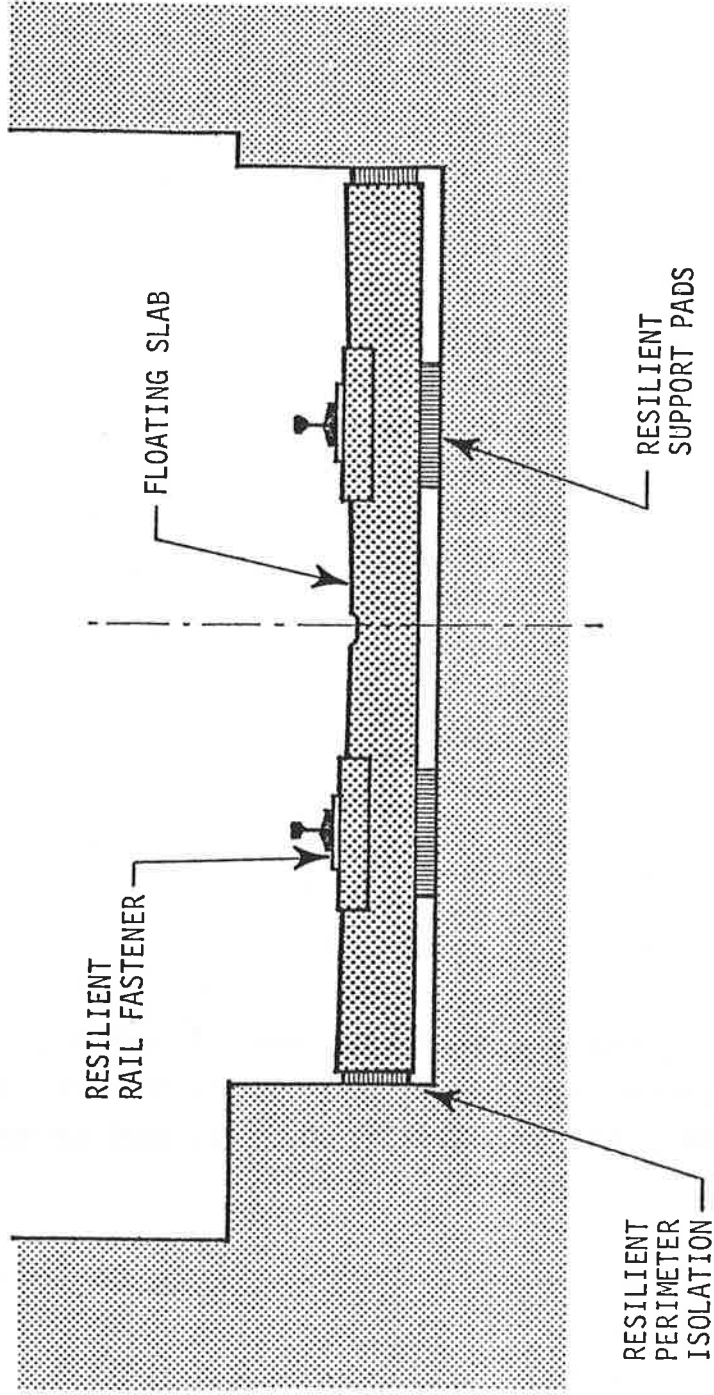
SECTION OF CONTINUOUS CAST-IN-PLACE FLOATING SLAB FOR CONCRETE BOX STRUCTURE
